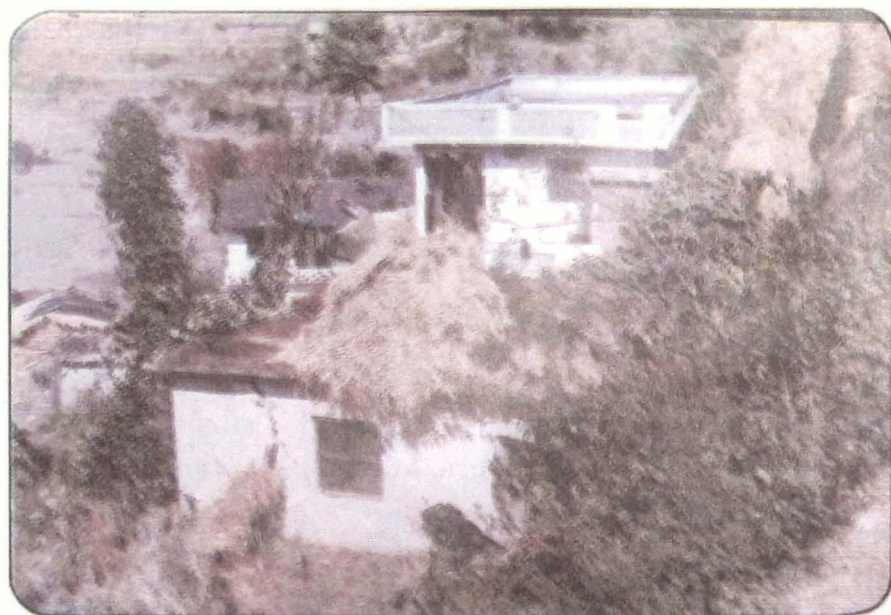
Shear cracks in a house in Thati Kuthur village.
